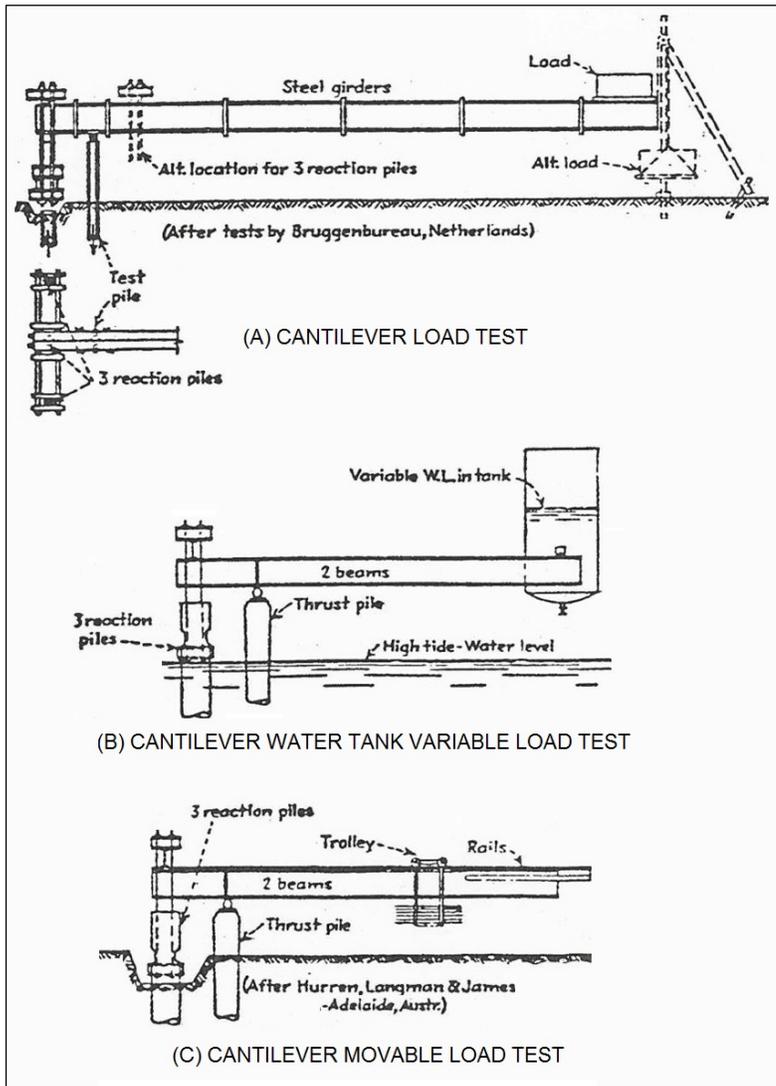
32: Cantilever Load Test Conditions for Piles
